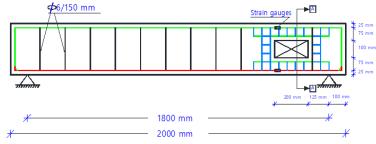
Detailing of reinforcement steel for strengthened beam (B3).
